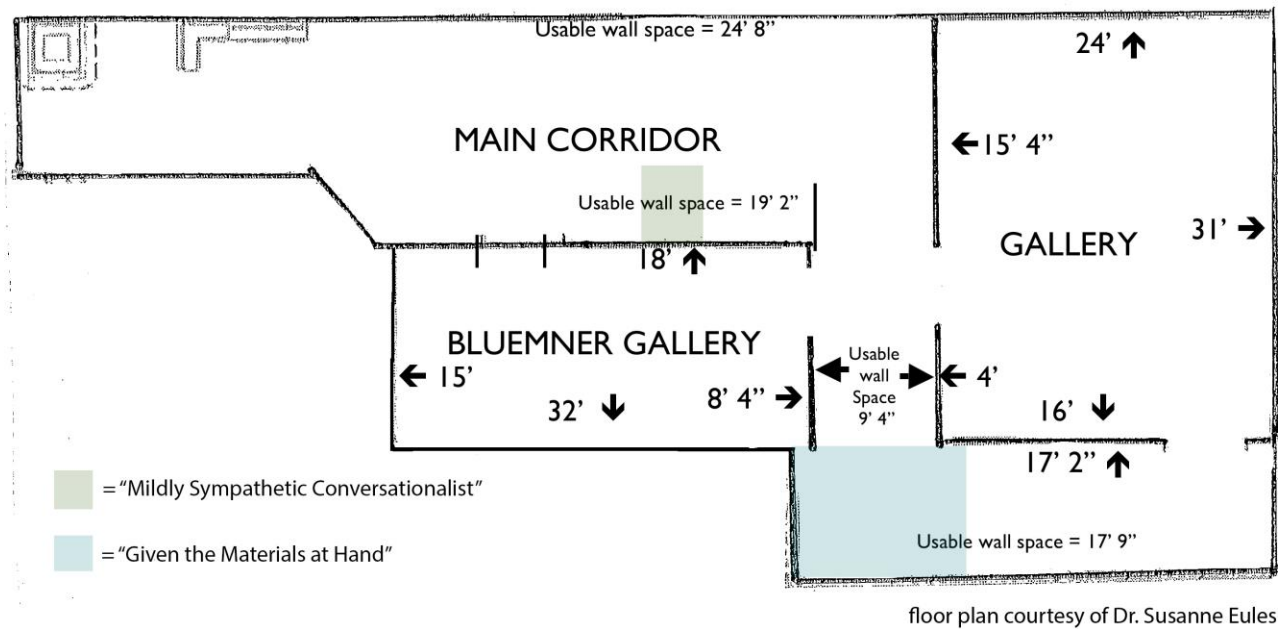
Hand Art Center: plan view of gallery wall space depicting placement of works. (Portion of the figure provided by Dr. Susanne Eules)
